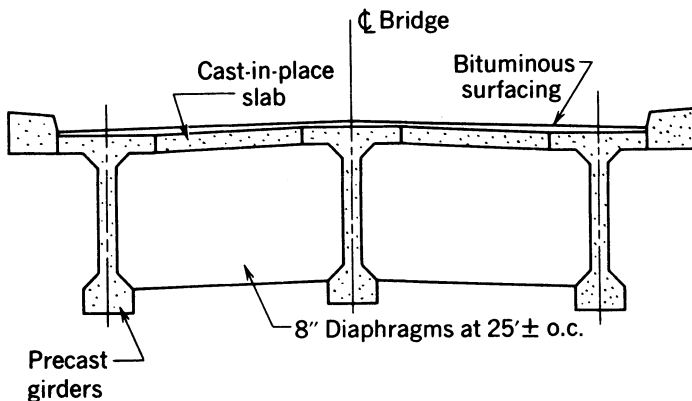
Section of a long-span bridge with precast prestressed-concrete girders.
